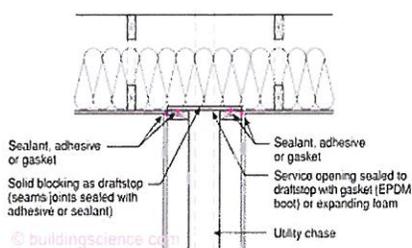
Seal the wall drywall to the top plate and ceiling drywall.
